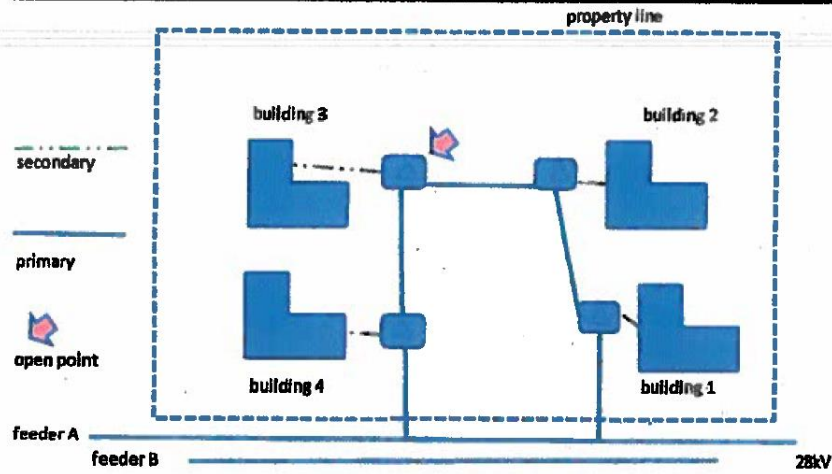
MULTI BUILDING CONNECTION greater than 1,000kVA
